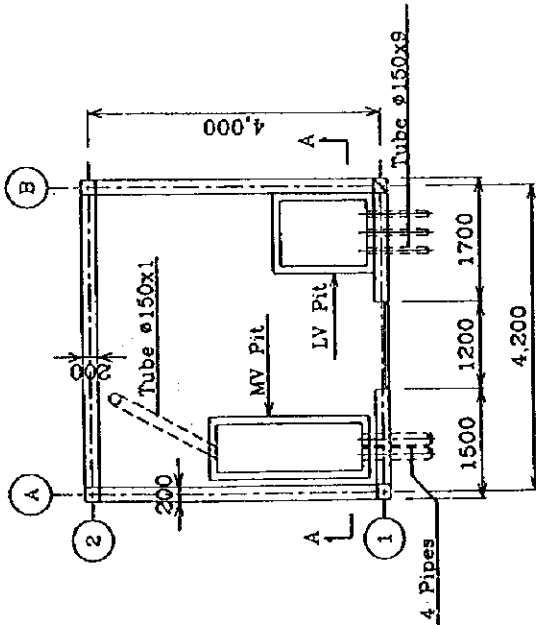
(1) Indoor Type Substation, Arrangement of Equipment
